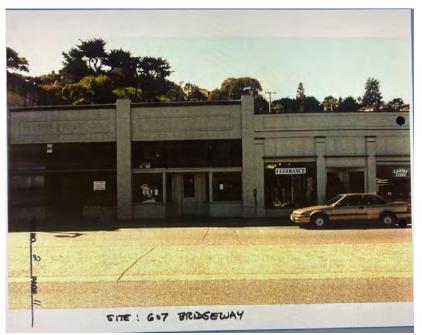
1993, site photos by Heine, designer for 607 Bridgeway "Cakery" store proposed project (City of Sausalito, digitized building records)
